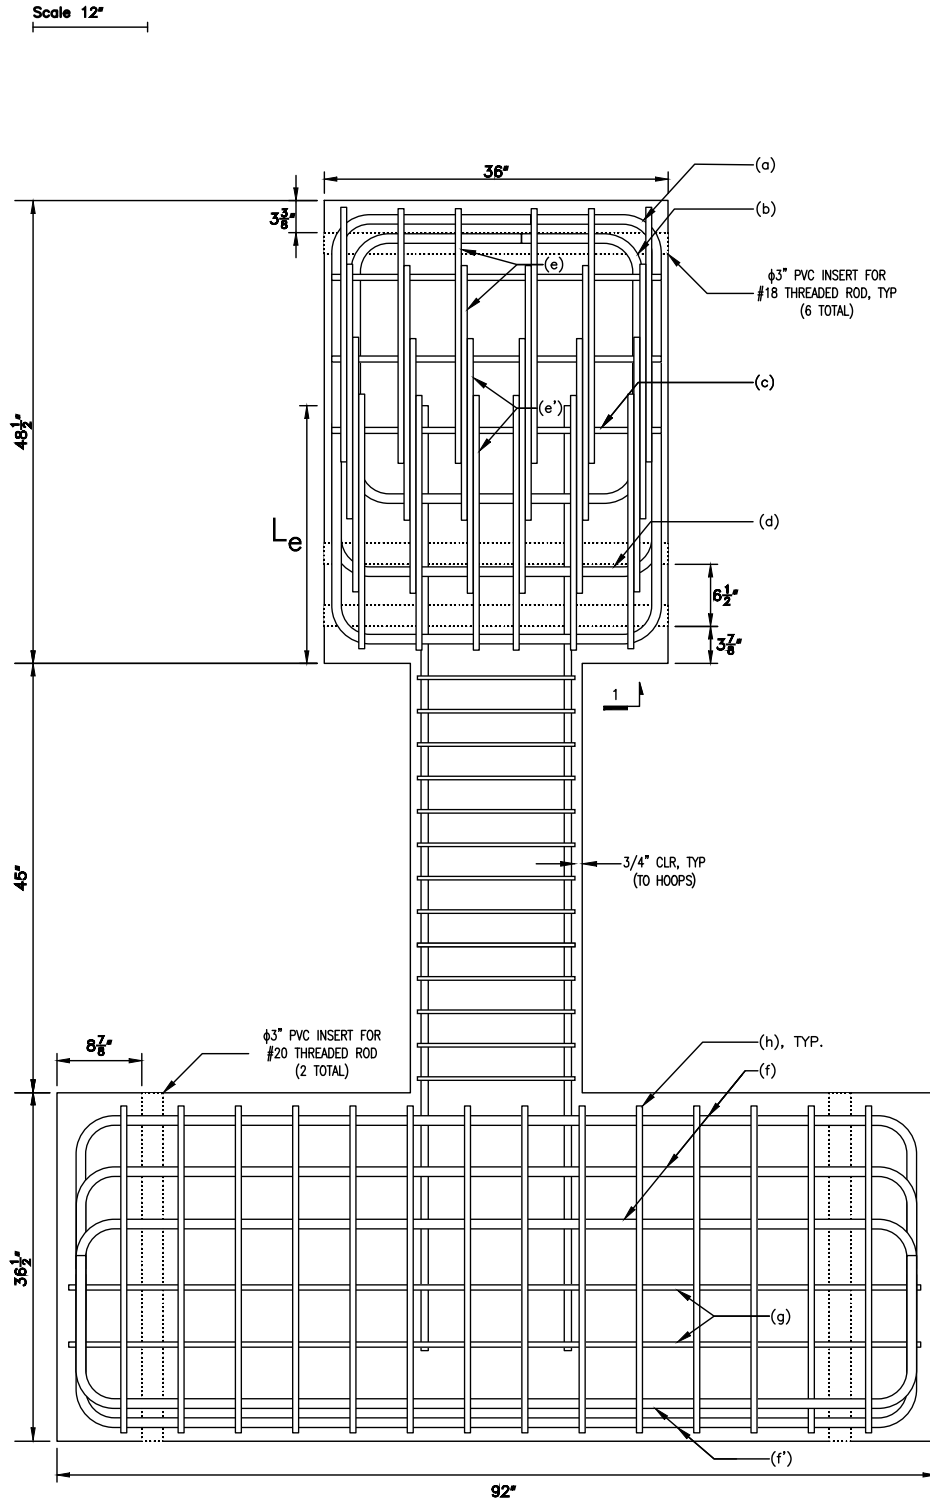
Elevation view of P80-2.5 (1 in. = 25.4 mm)
